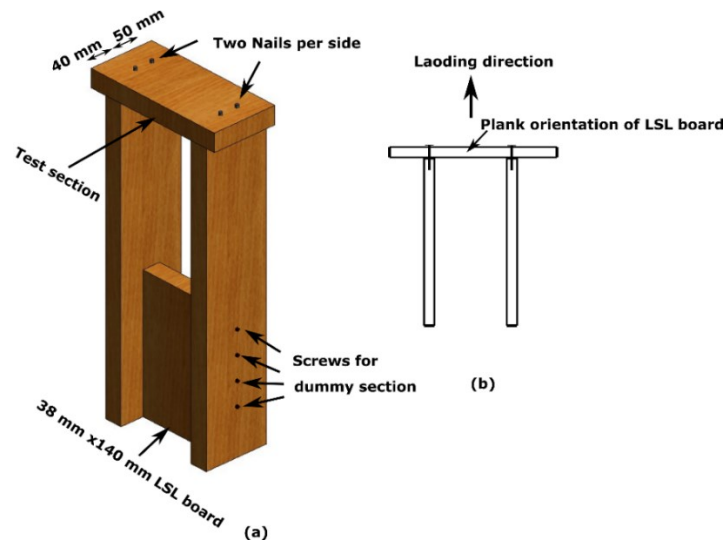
(a) Sample D construction details (b) Loading direction along nail withdrawal.
